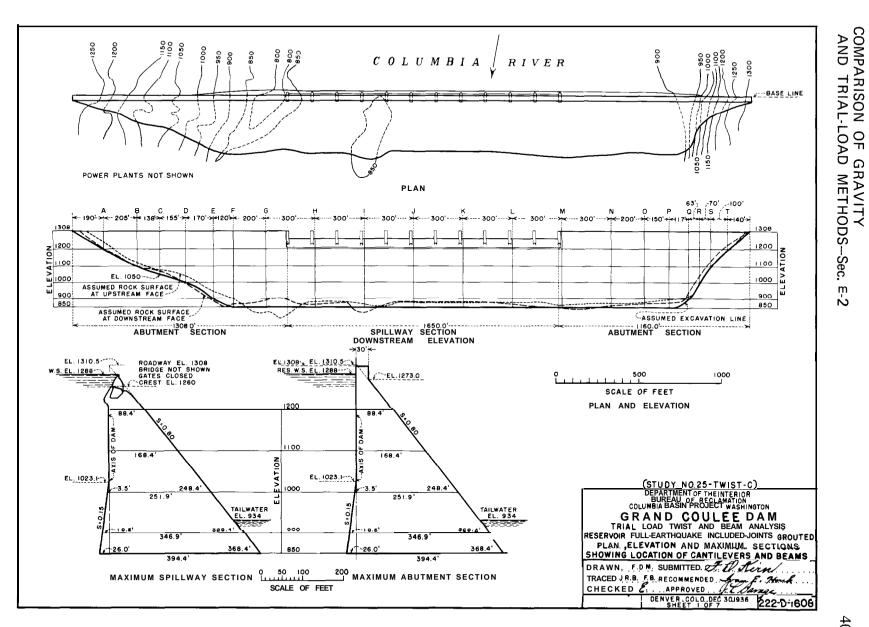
Grand Coulee Dam-plan, elevation, and maximum sections.
